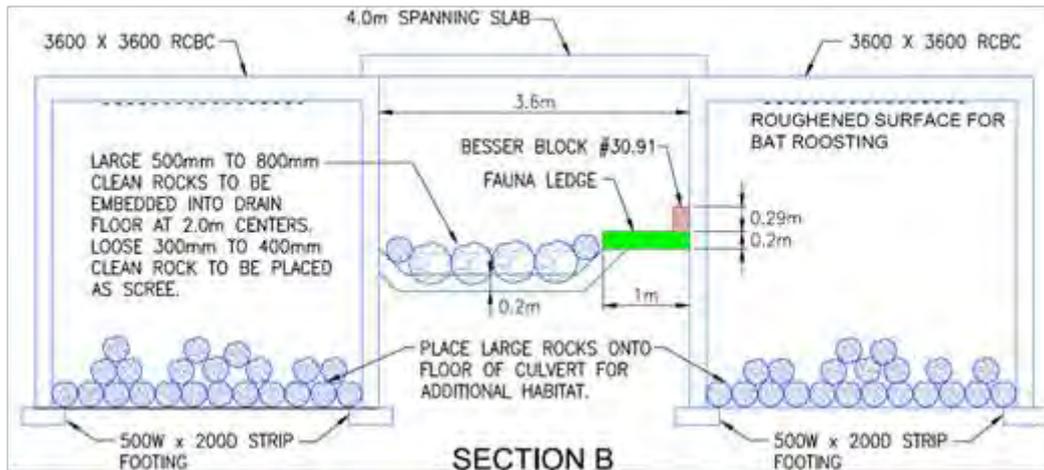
17 CH 2400 Fauna culvert cross section showing scree and fauna ledges.
